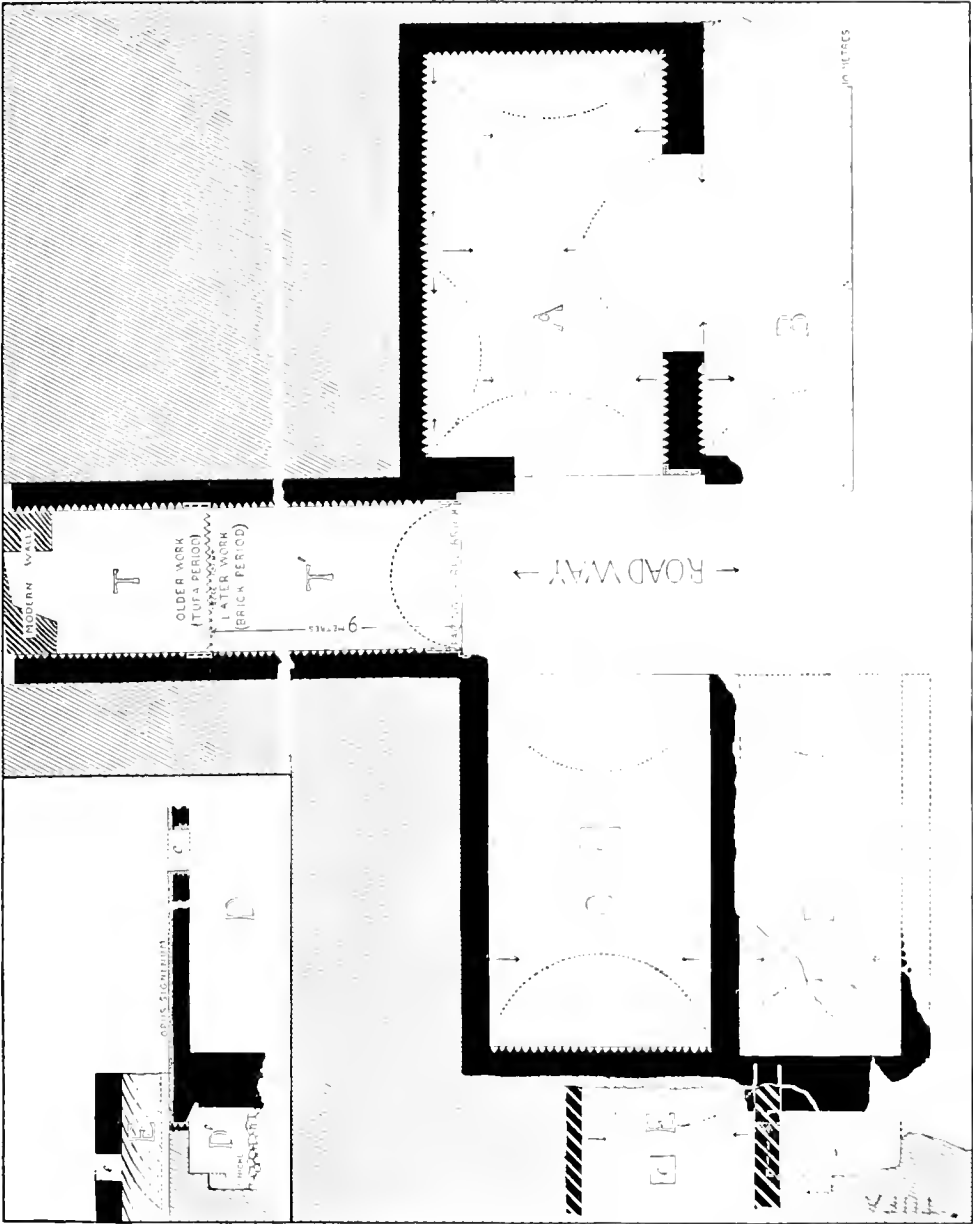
PLAN OF TUNNEL AND VAULTS.
